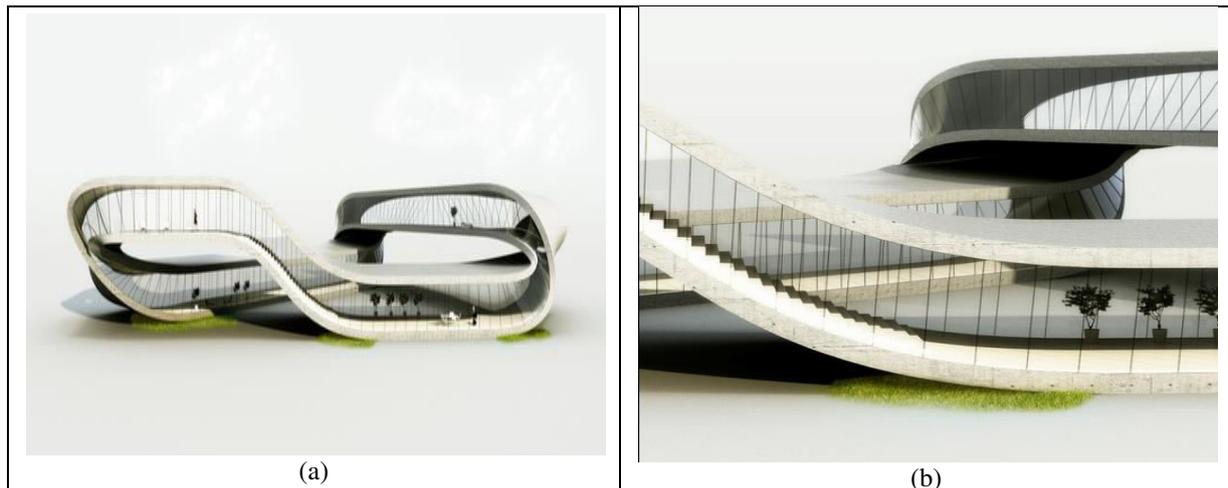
The project “Landscape House”: (a) building view; (b) floor construction.
